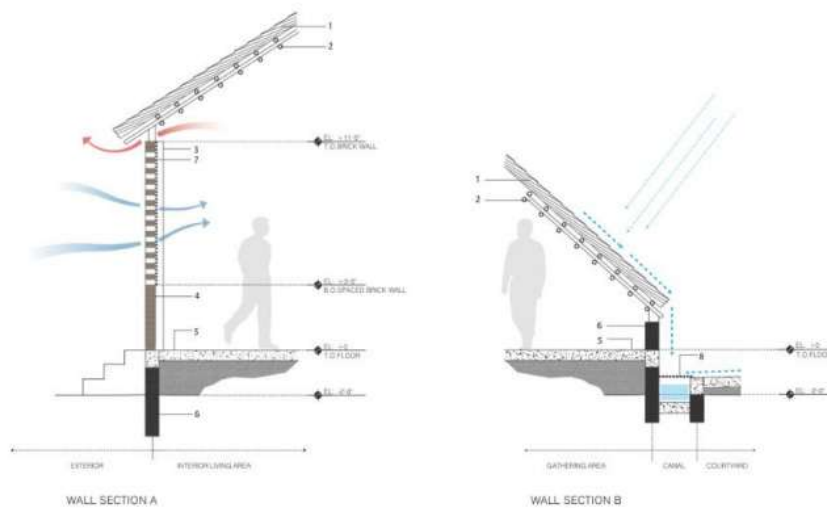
Wall Details of Cultural Centre, Sinthian, Senega
